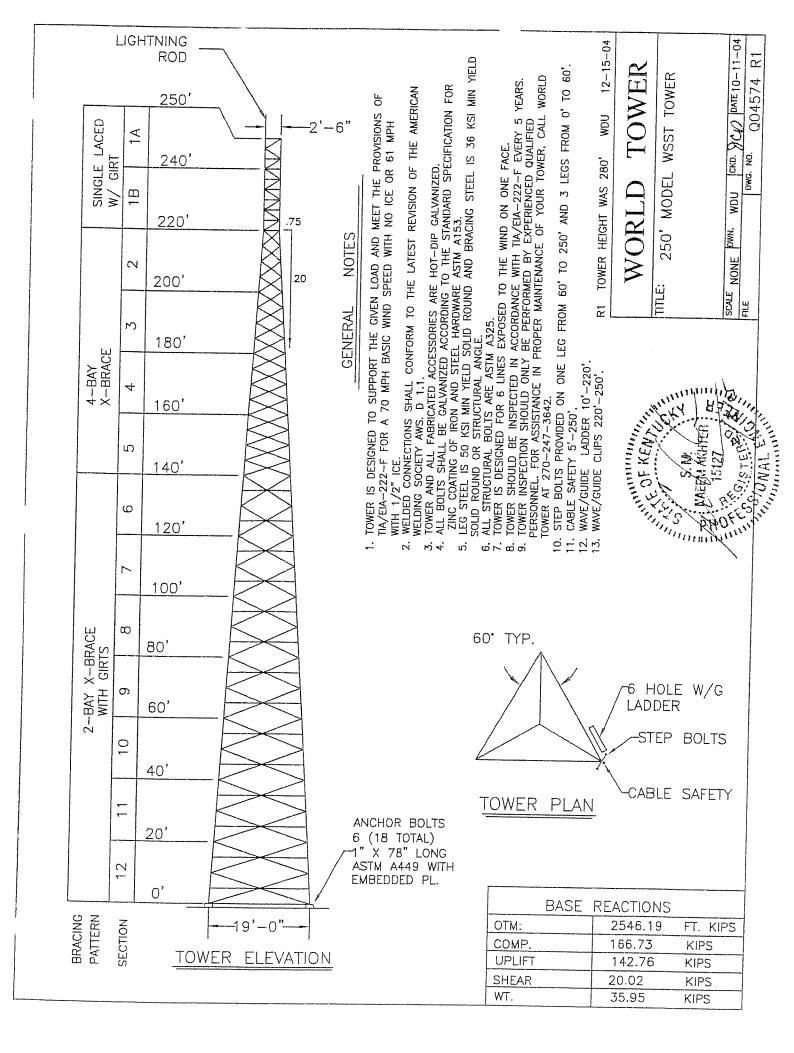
TOWER AND FOUNDATION DESIGN
